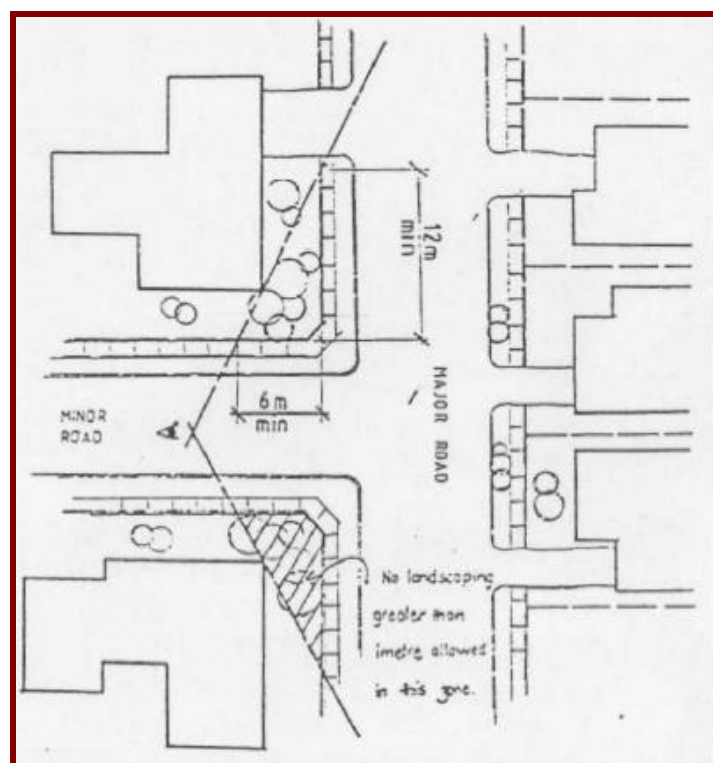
Protecting sight lines on corner lots (source: Wyong DCP Chapter 99)
